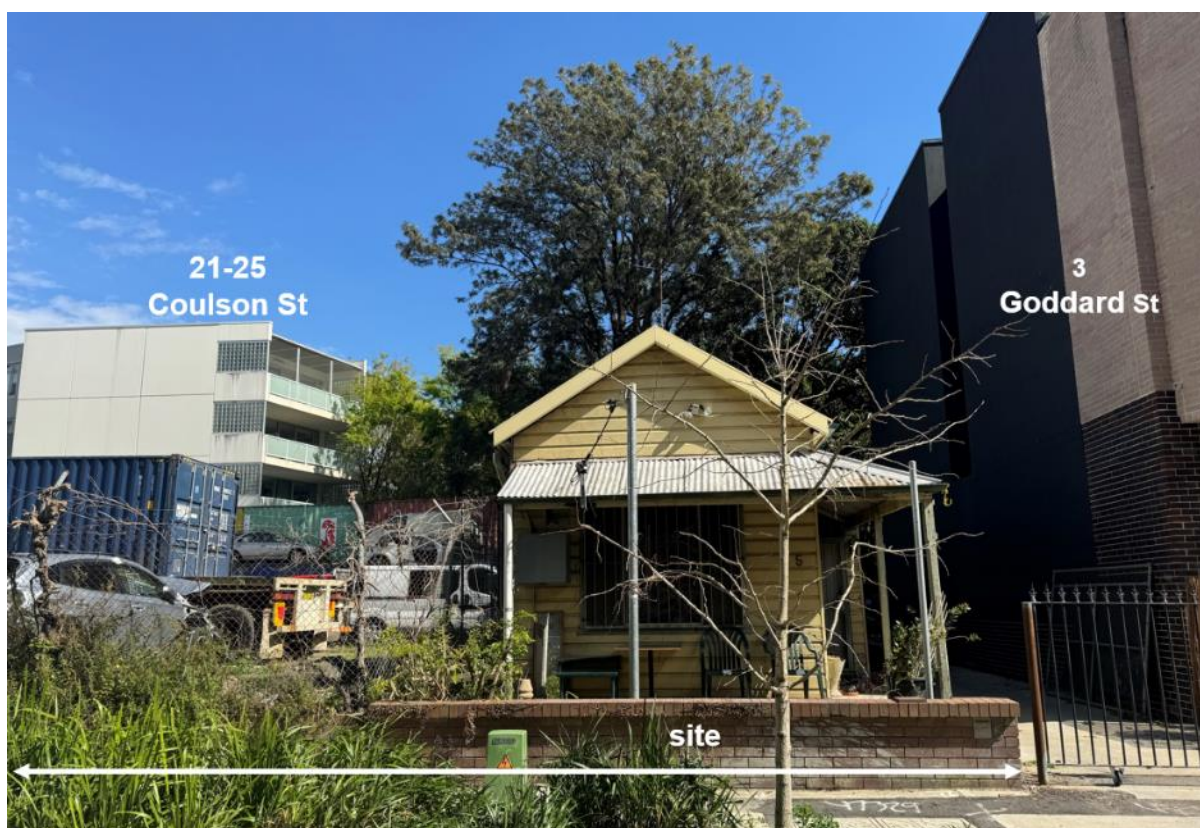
Site (5 Goddard Street) viewed from Goddard Street
